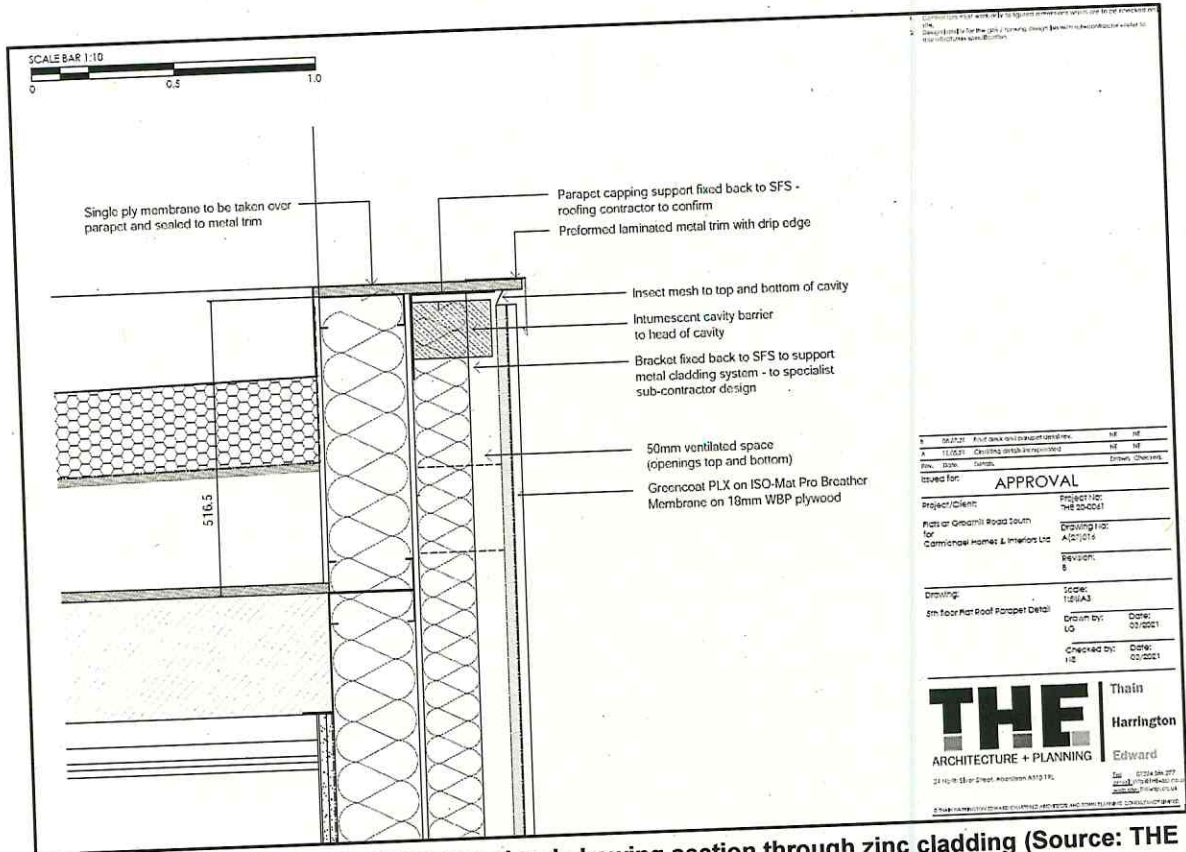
Typical wall detail at fifth floor level showing section through zinc cladding (Source: THE Architecture & Planning)
